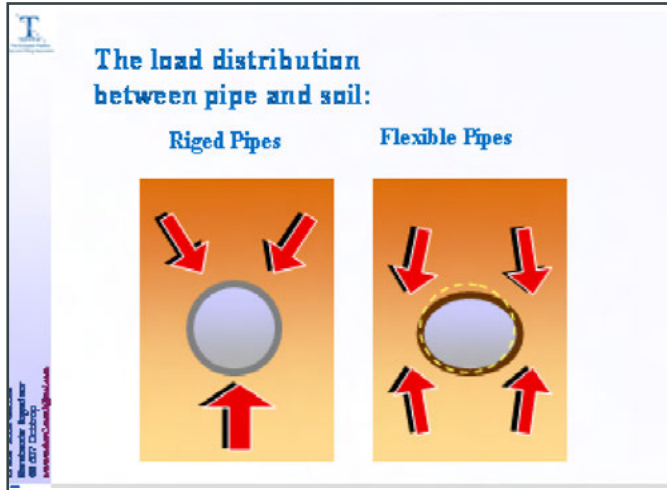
Rigid and Flexible Pipe Loading with the surrounding soil
